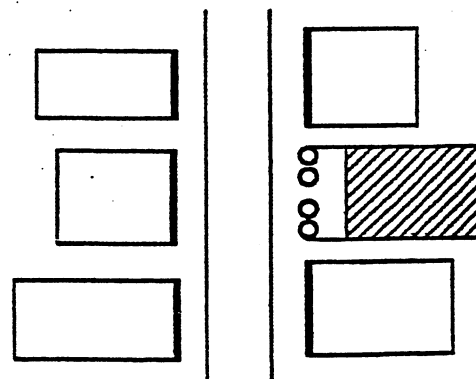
Architectural or landscape elements (such as fences, walls or plant materials) can be used to help maintain the setback line when the building itself is set back.
